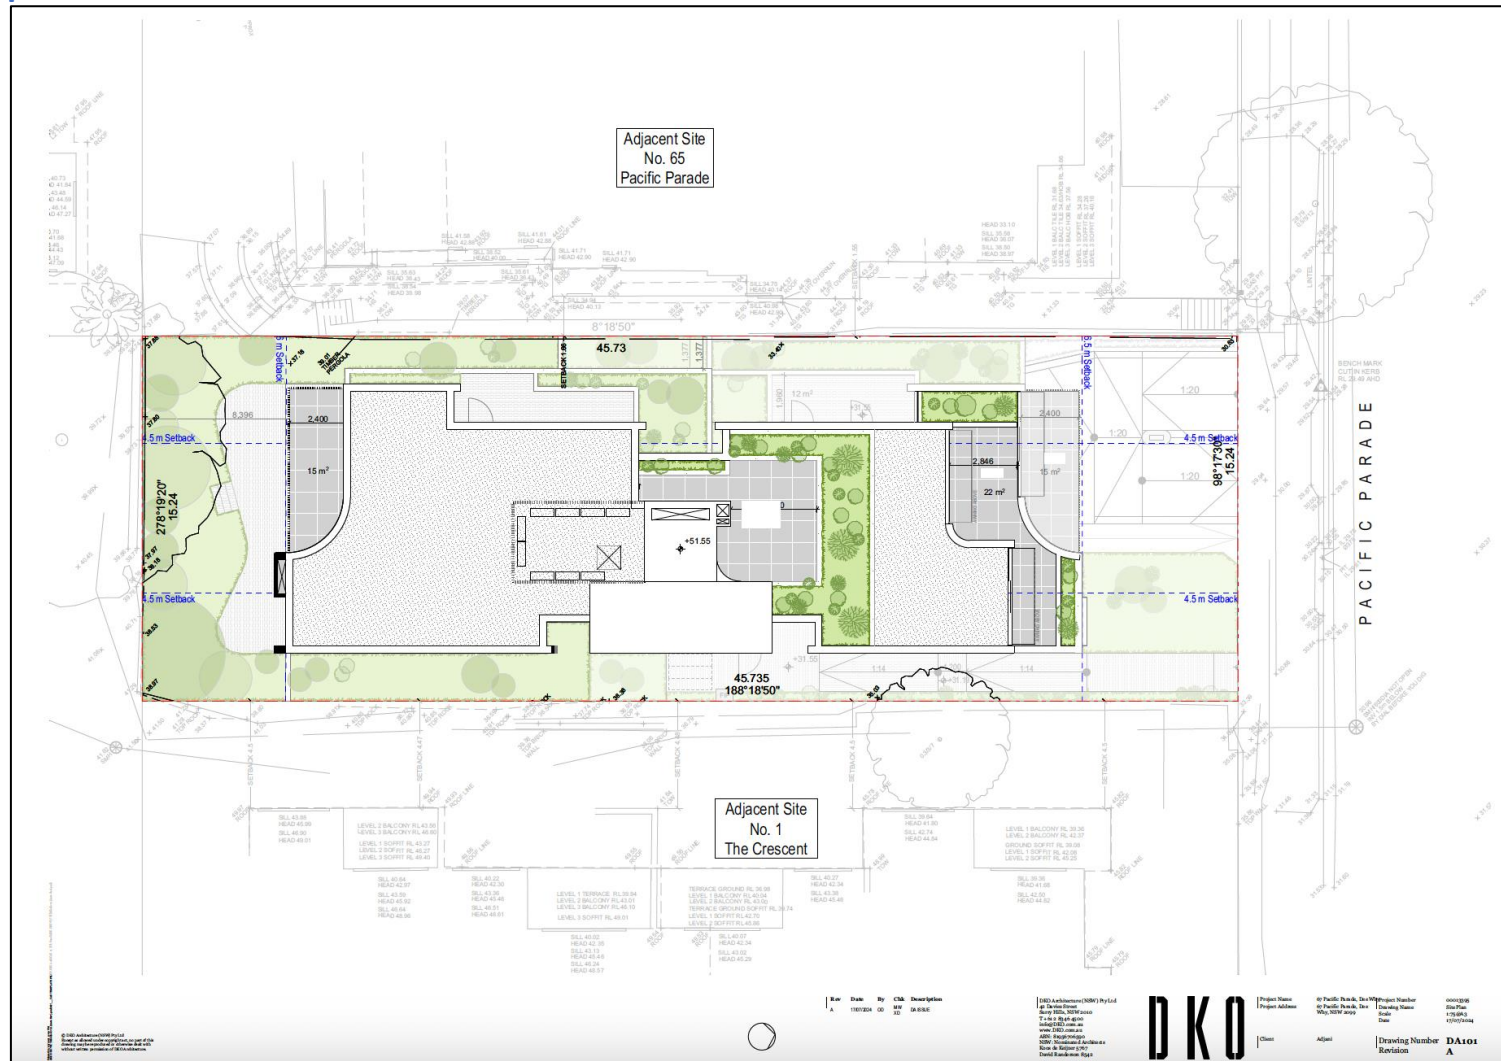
ILLUSTRATES PROPOSED SITE PLAN
